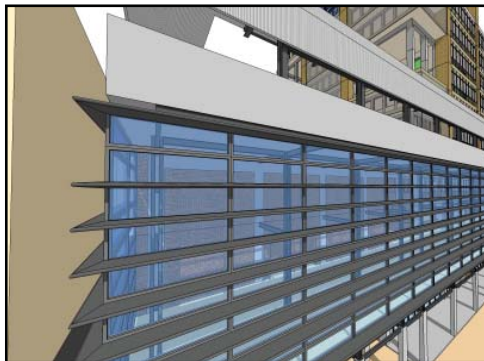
Glazed northern facade with horizontal aluminium extrusions fixed to the structural window frame system
